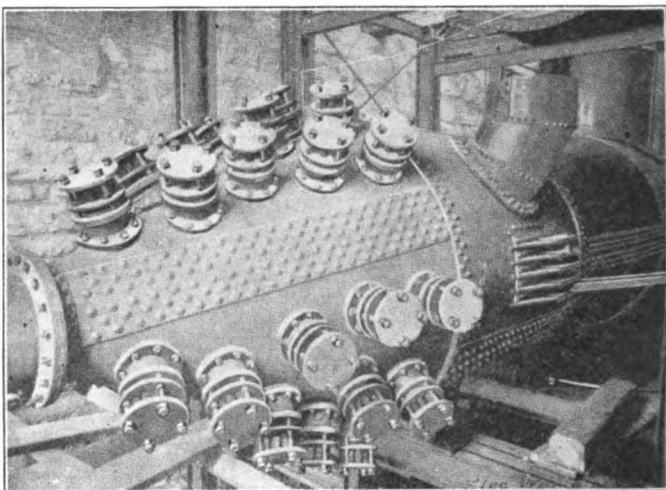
Relief Valve on end of Penstock. Niagara Falls Hydraulic Power Manufacturing Co. (*Electrical World*, Jan. 14, 1899.)
